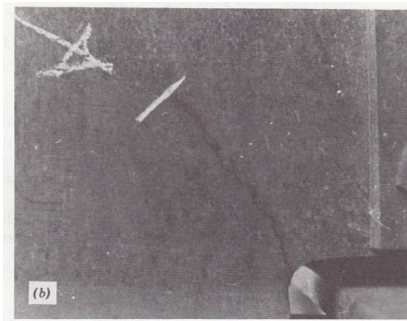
Fatigue cracks initiated in holes filled with filler material.
